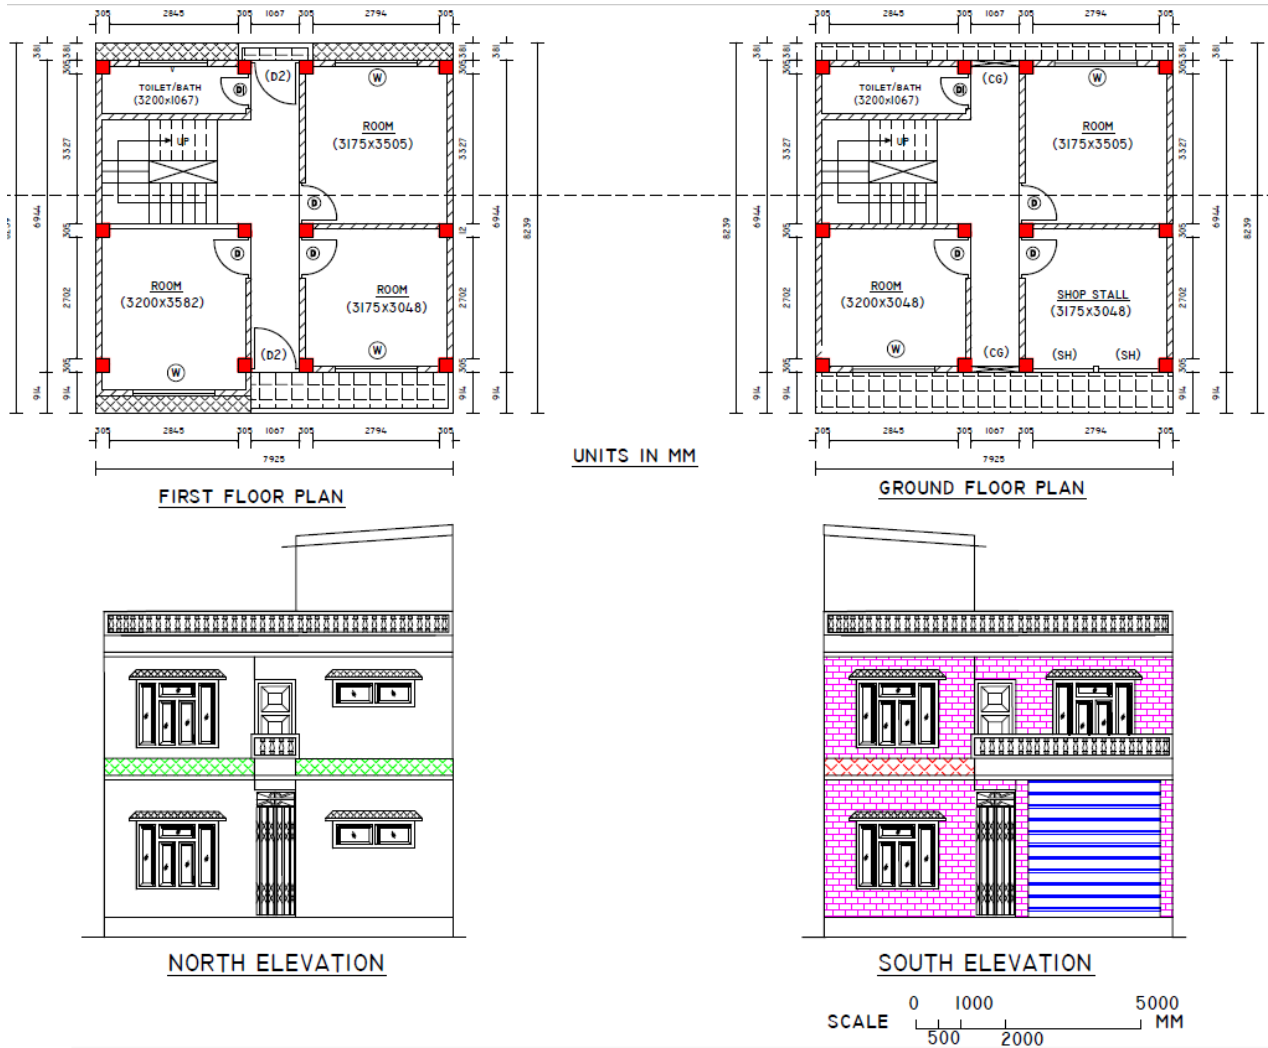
Residential reinforced concrete (Res. RC) building with floor area: 111.8m² (55.02m²+56.86 m²)
